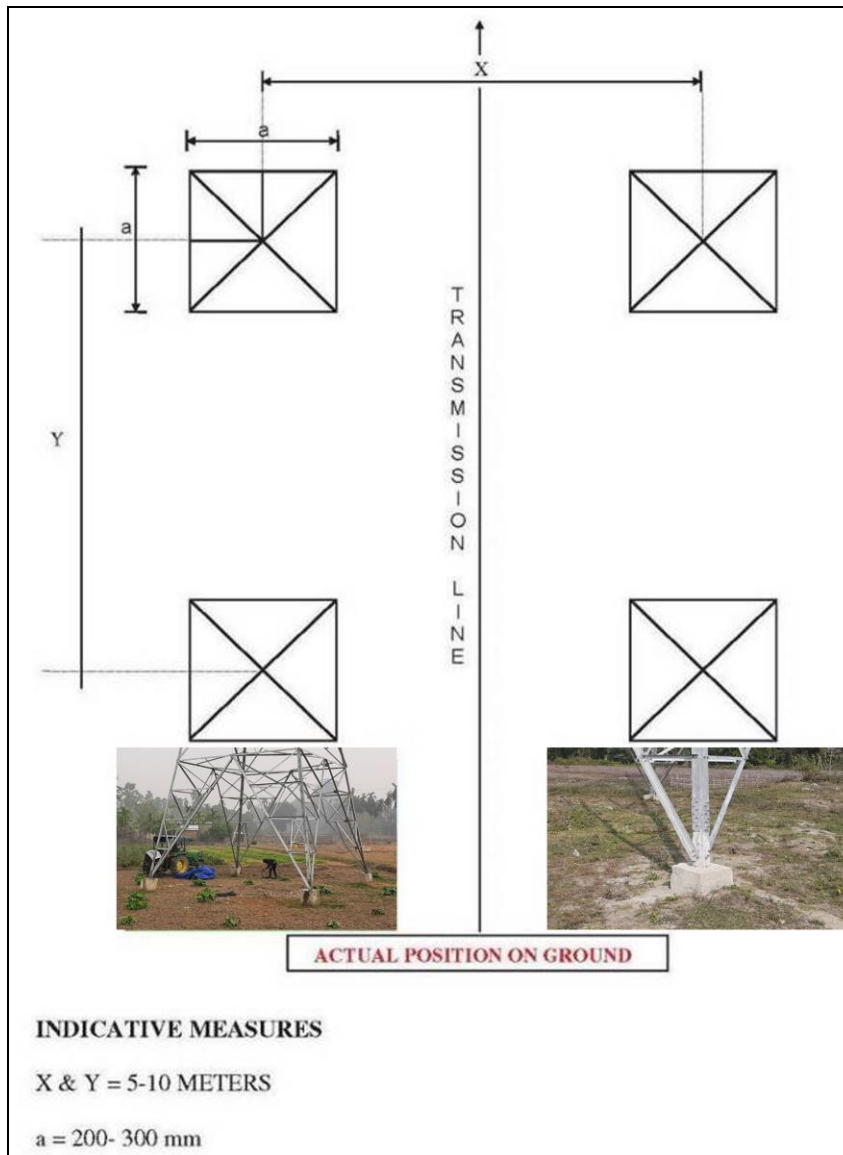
Typical Plan of Transmission Line Tower Footing Showing actual Ground Position and Extent of Impact
